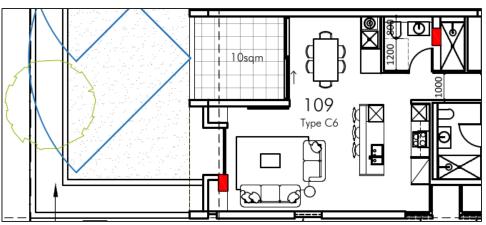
Extract of Floorplan of Apartment 109 on Level 1
